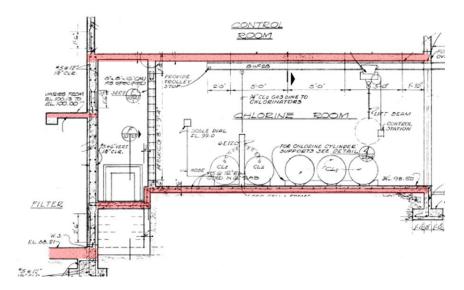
Control/Treatment Building (1970) and Filter Floor/Roof Levels not Aligned (Source Drawings: "Water Treatment Plant (A700004)")
